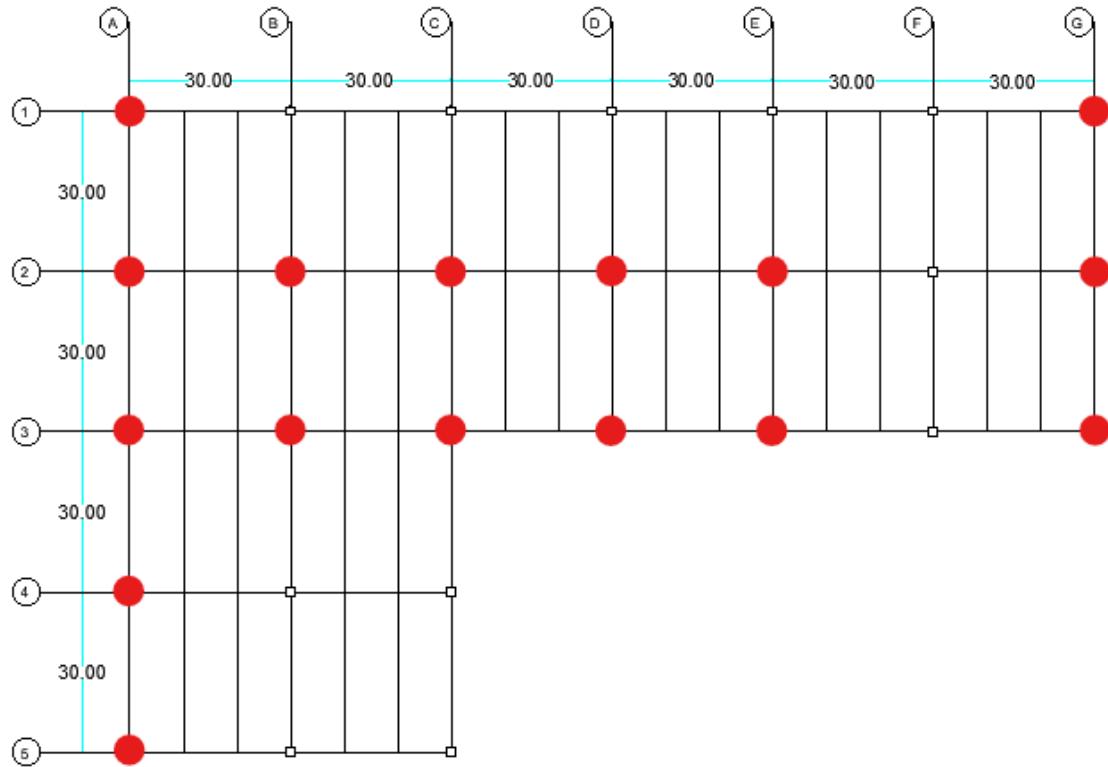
Conceptual plan for location of moment connections for moment frame. The red markers indicate a direct-welded moment connection throughout all 8 levels.
